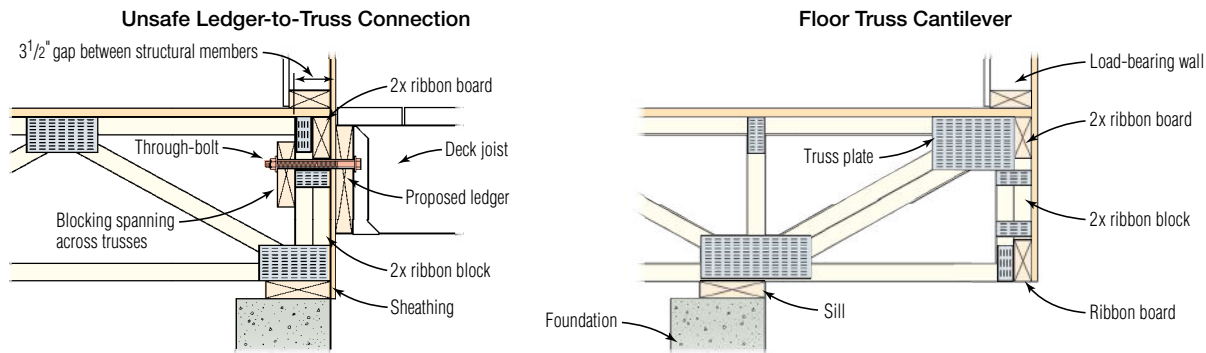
Above at left is a problematic bolted deck-ledger-to-floor-truss connection. Note that the bolts anchoring the proposed deck ledger to the floor system must span a 3 1/2-inch-wide gap between the blocking spanning the truss ends and the inside face of the wall sheathing, a precarious and improper connection detail with unknown capacity to support occupant live loads. Above right is a cantilevered truss designed to support a load-bearing wall but not a deck ledger. The vertical 2x4 ribbon block is not a suitable connection point, with the vertical load capacity limited by the strength of a structural connection between the deck ledger, sheathing, ribbon block, and plated end vertical. Engineering is required for a proper structural connection between a deck ledger and truss floor system.
